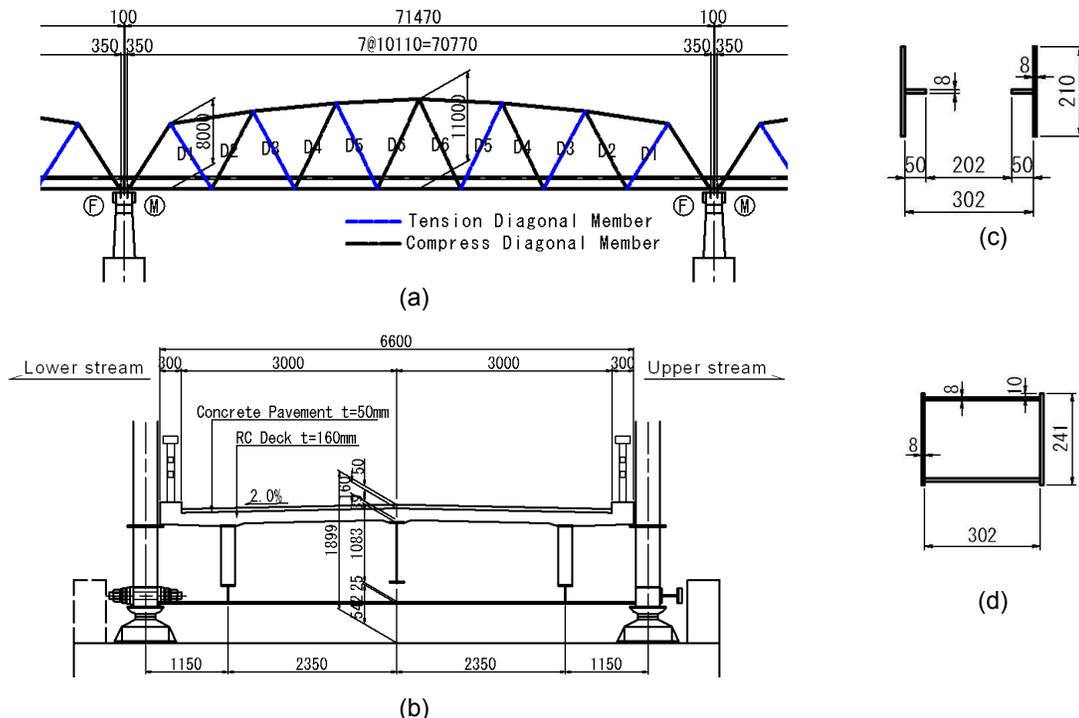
Steel truss bridge investigated: (a) side view of single span, (b) cross section of the bridge, (c) cross section of tension diagonal member, (d) cross section of compression diagonal member. Unit [mm].
